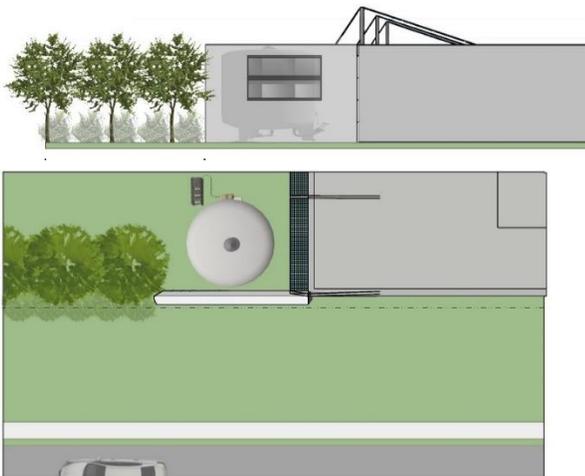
ABOVE GROUND STORAGE TANKS REQUIRE A SCREENING WALL THAT MATCHES THE MAIN STRUCTURE AND COMPLETELY SCREENS THE ABOVE GROUND STORAGE TANK FROM VIEW. IN ADDITION, LANDSCAPE SCREENING SHOULD BE PROVIDED.
